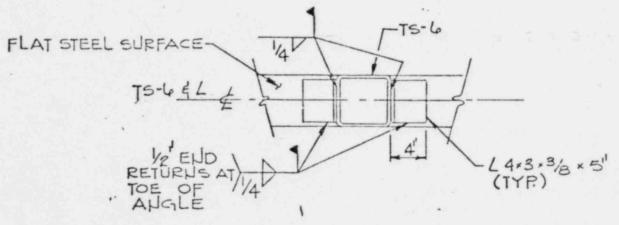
TYPICAL CROSSOVER BEAM CONNECTION
